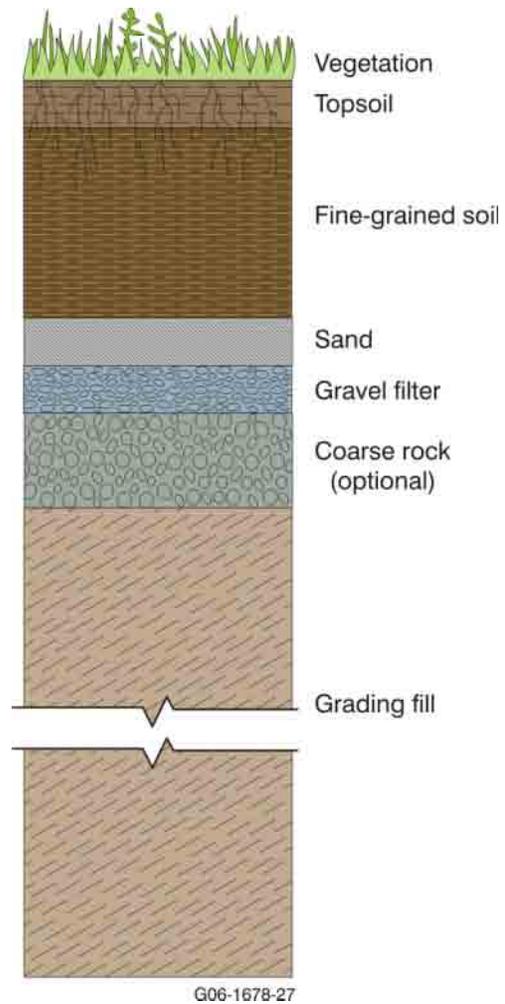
Cross section of a typical evapotranspiration surface barrier (Alternative 2b).
